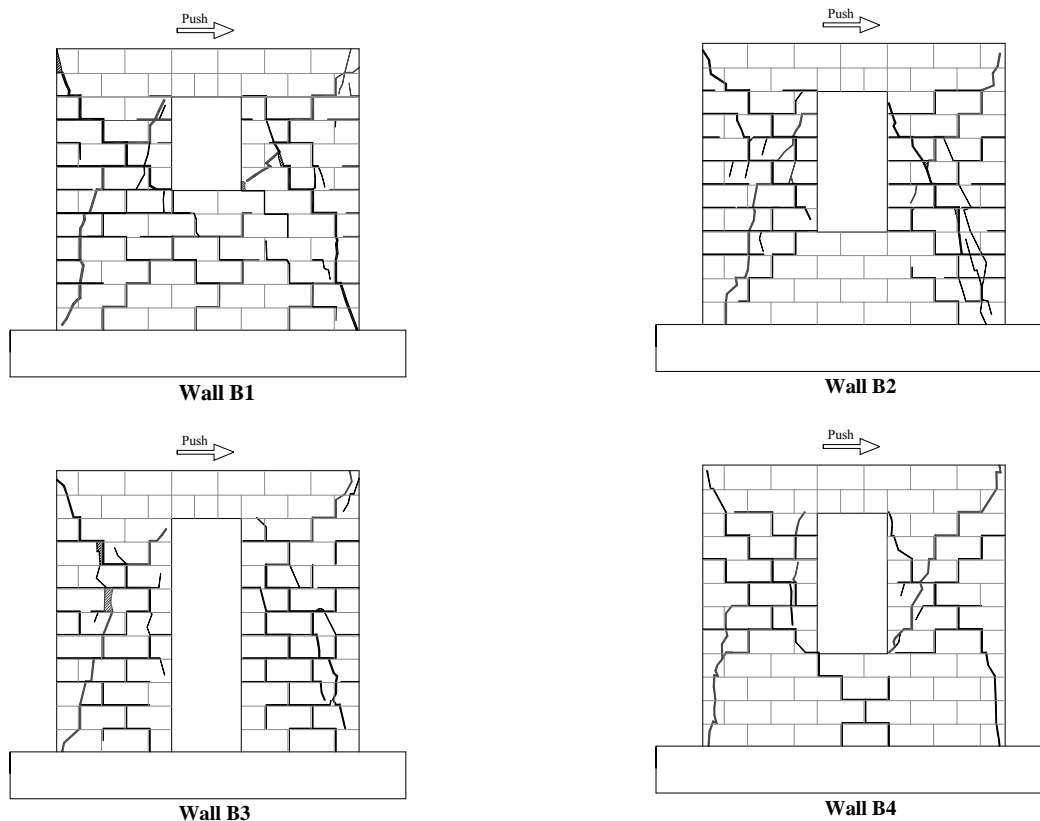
Series B, masonry wall cracking patterns at end of testing at end of testing.
